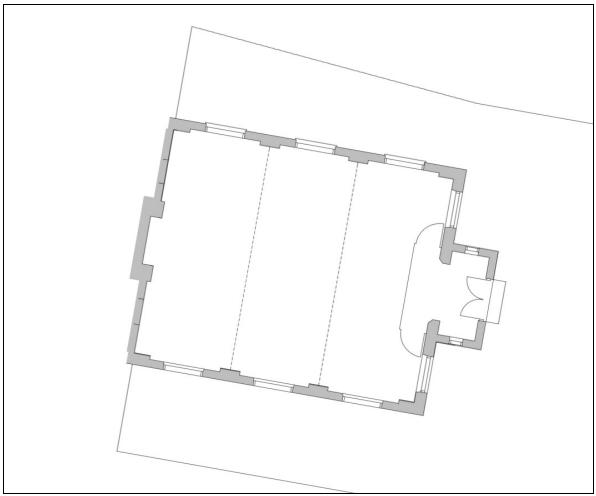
Layout of Green Chapel, based on the drawing submitted with the planning application, drawn by Paul Titley, Architectural Consultant New Cottage, Eyton, Leominster HR6 OAQ. The plan is an accurate reflection of the layout of the chapel.
